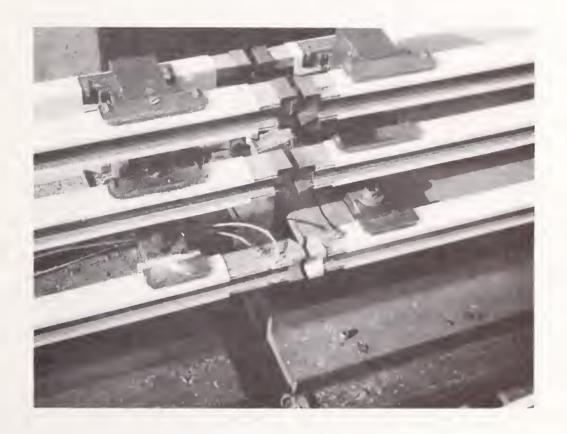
RAIL ENDS IN GUIDEWAY SWITCH AREA
